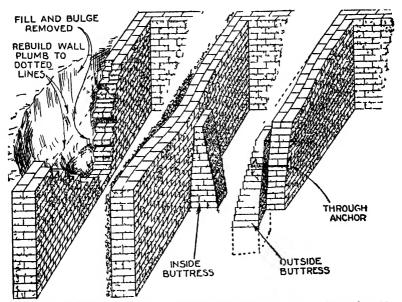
,596.—Bulging foundation wall due to filling in before mortar hardened.
